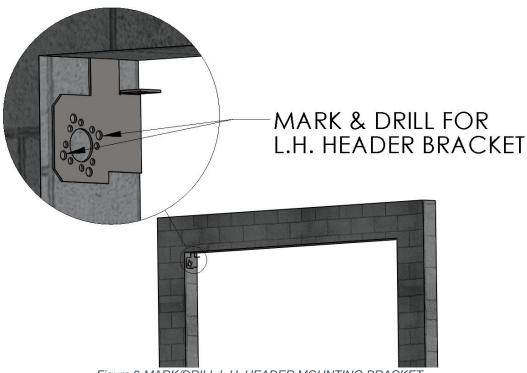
MARK/DRILL L.H. HEADER MOUNTING BRACKET
